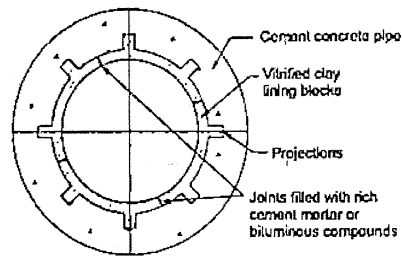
Cement concrete pipe, lined inside with vitrified clay lining
